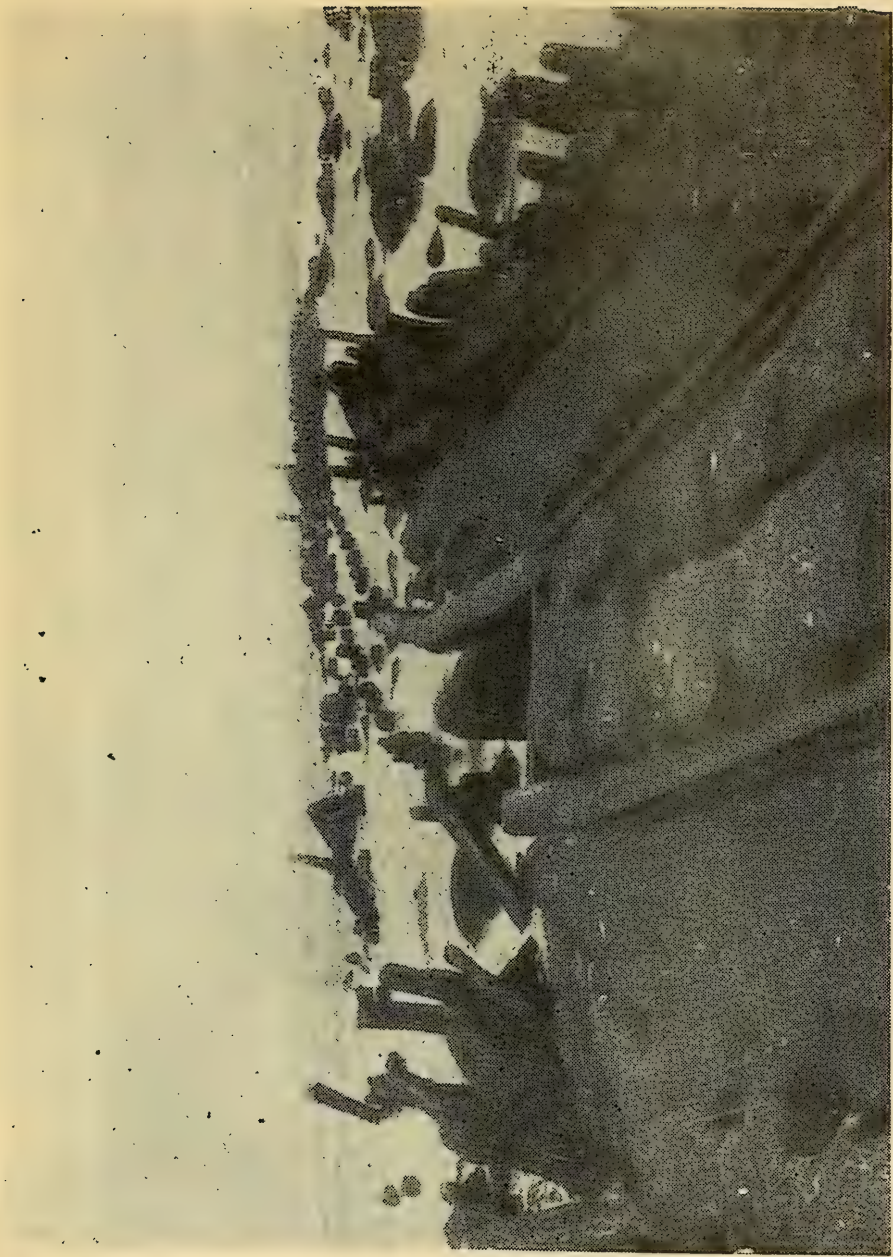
The north section of the connecting dam at Hook of Holland which was damaged and partially destroyed by high tides. Picture taken in August 1947 at half tide.
